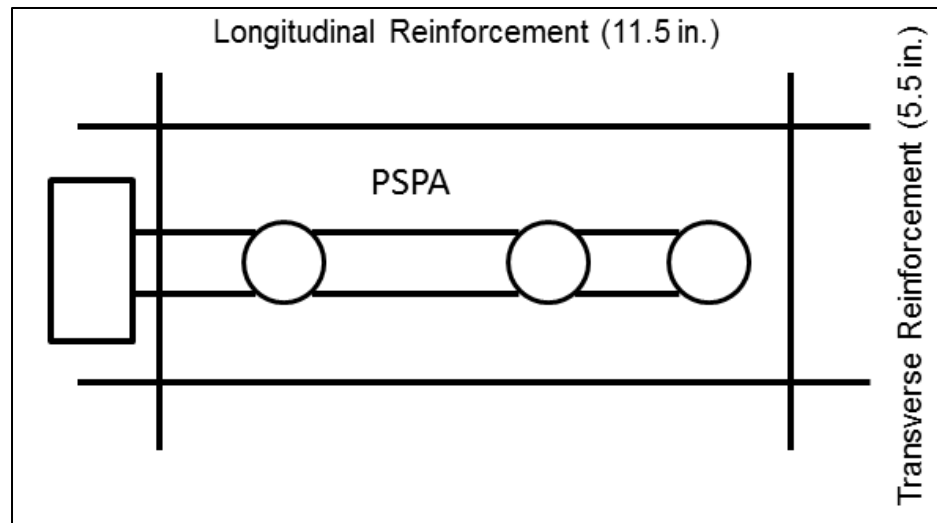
Sketch of the test location of the instrument (PSPA) on deck surface.
